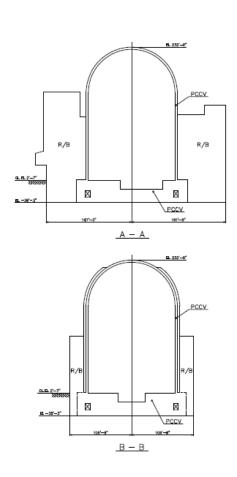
Critical Building Dimensions of US-APWR (Section Views)
